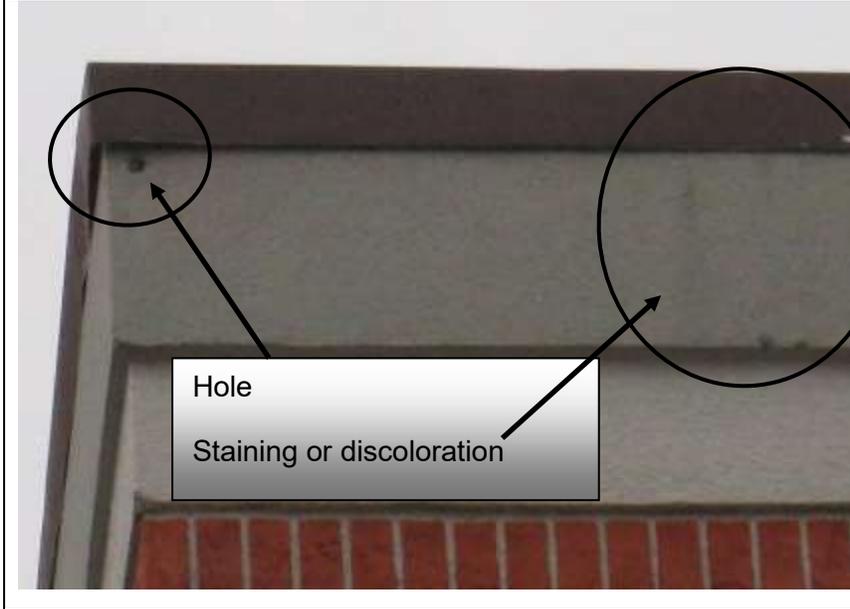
There were sections of older EIFS ("exterior insulation and finish systems" or often referred to as "synthetic stucco") on top trim just below parapet wall. There was hole(s) and water staining visible around upper cladding.
